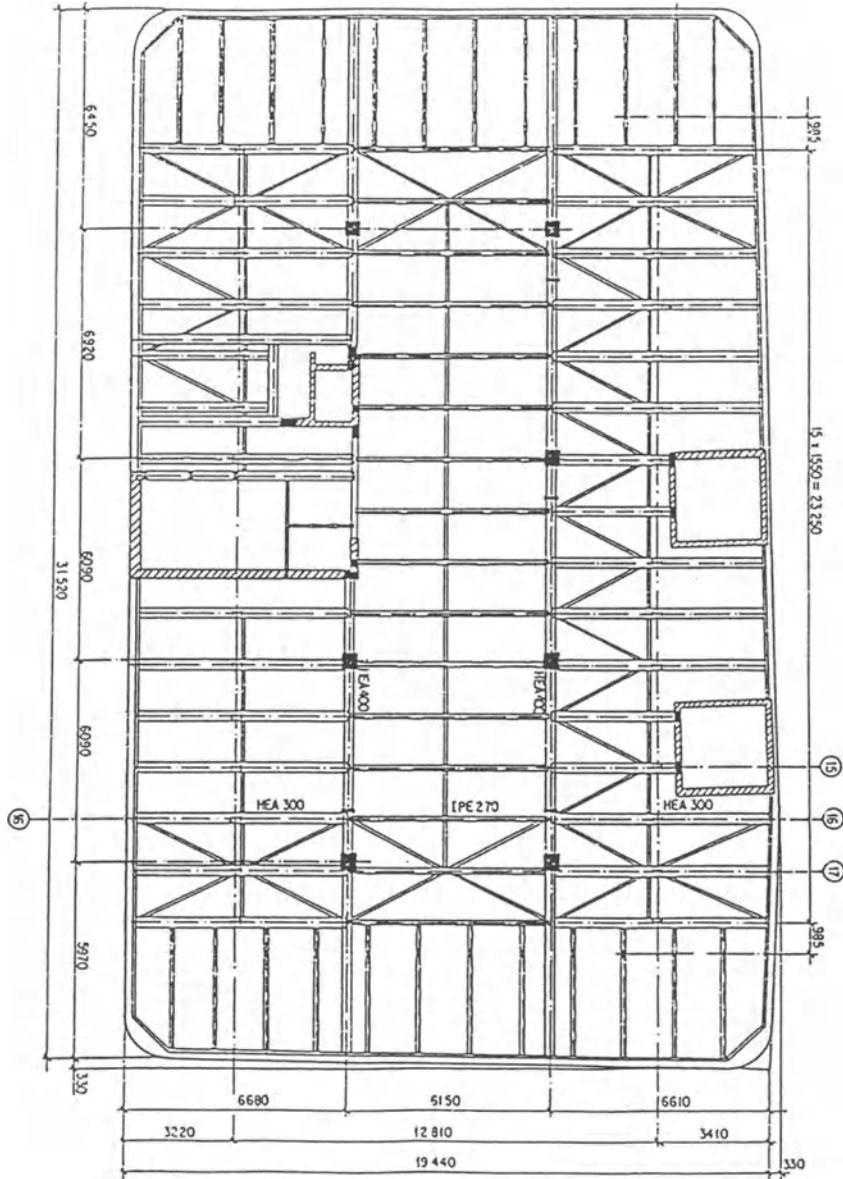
Grid substructure for preventing the loading of the concrete slab
